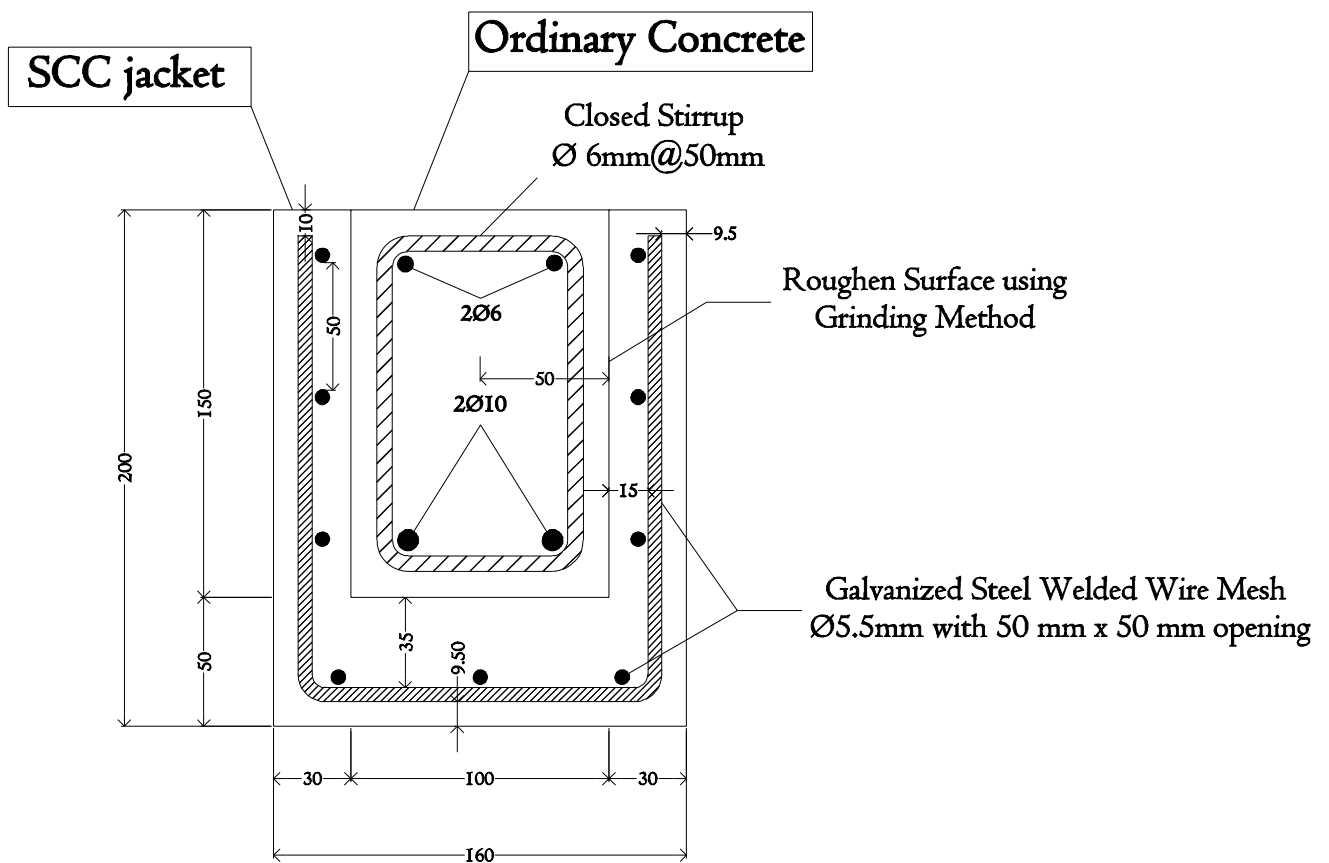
Strengthened beams GB.B5 cross section (mm).
